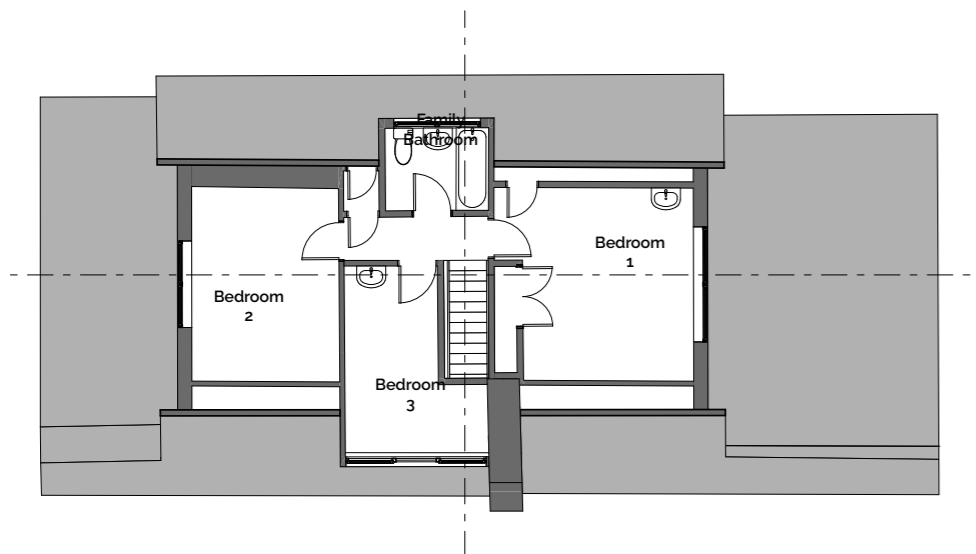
71 Leeson Road Existing First Floor Plan - Not to Scale
